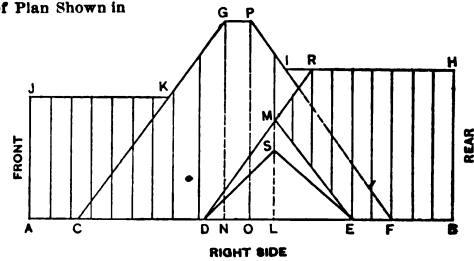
Right Elevation of Roof Plan Shown in Fig. 79.
